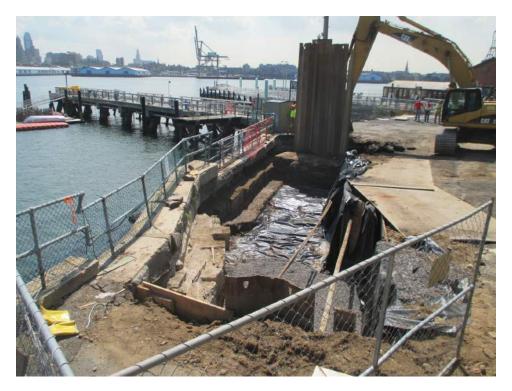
Feature 4 at the completion of excavation for the seawall repair from Stations 104+36 to 105+00, depicting the lower courses of existing seawall extending inland with excavation depth, facing southeast (Image 5131: August 5, 2014).
